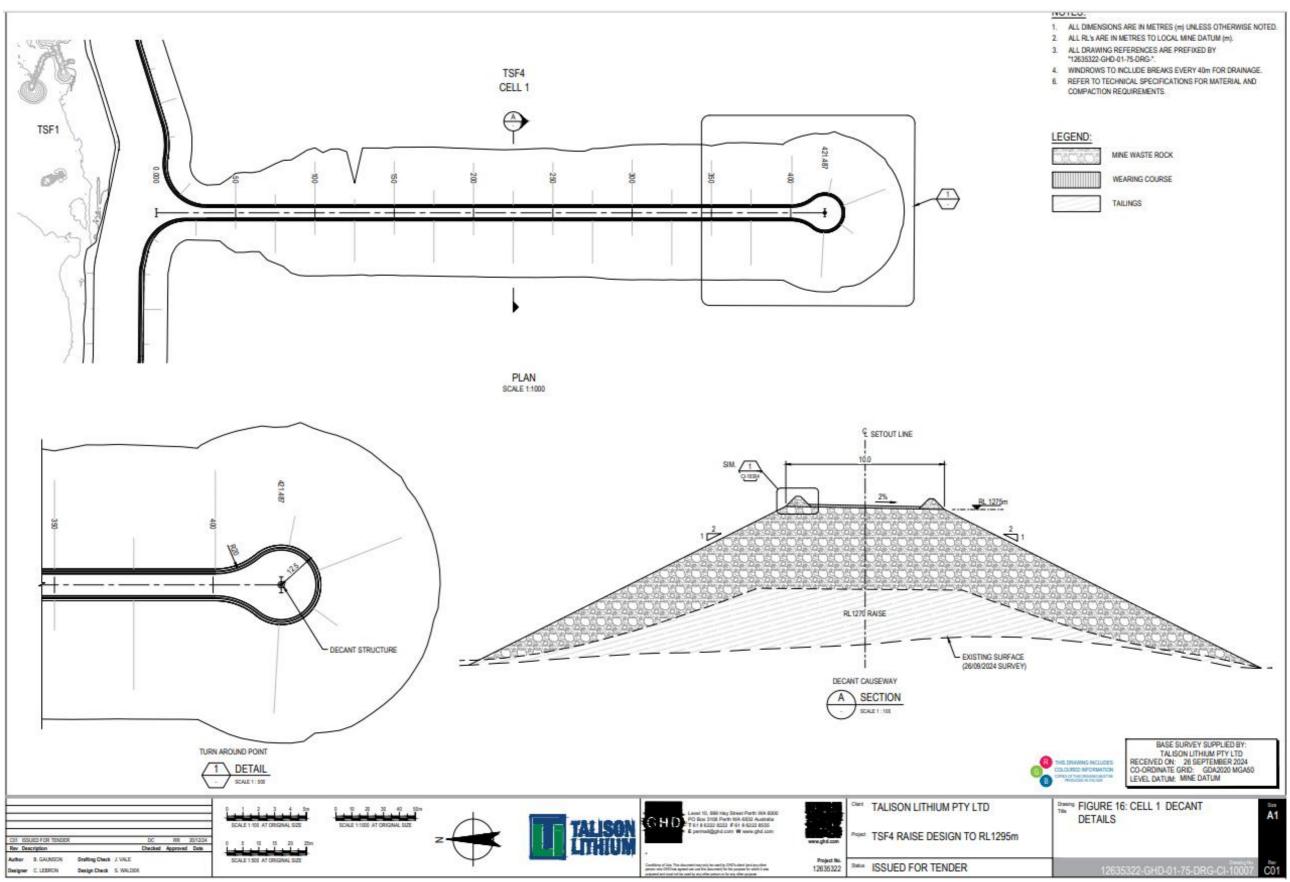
TSF embankment raise to 275 m AHD / 1275 m RL - Cell 1 decant detail
